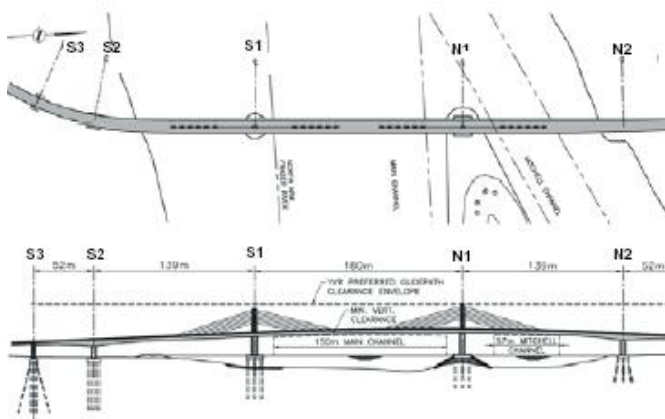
Plan and elevation of Canada Line North Arm Bridge.
